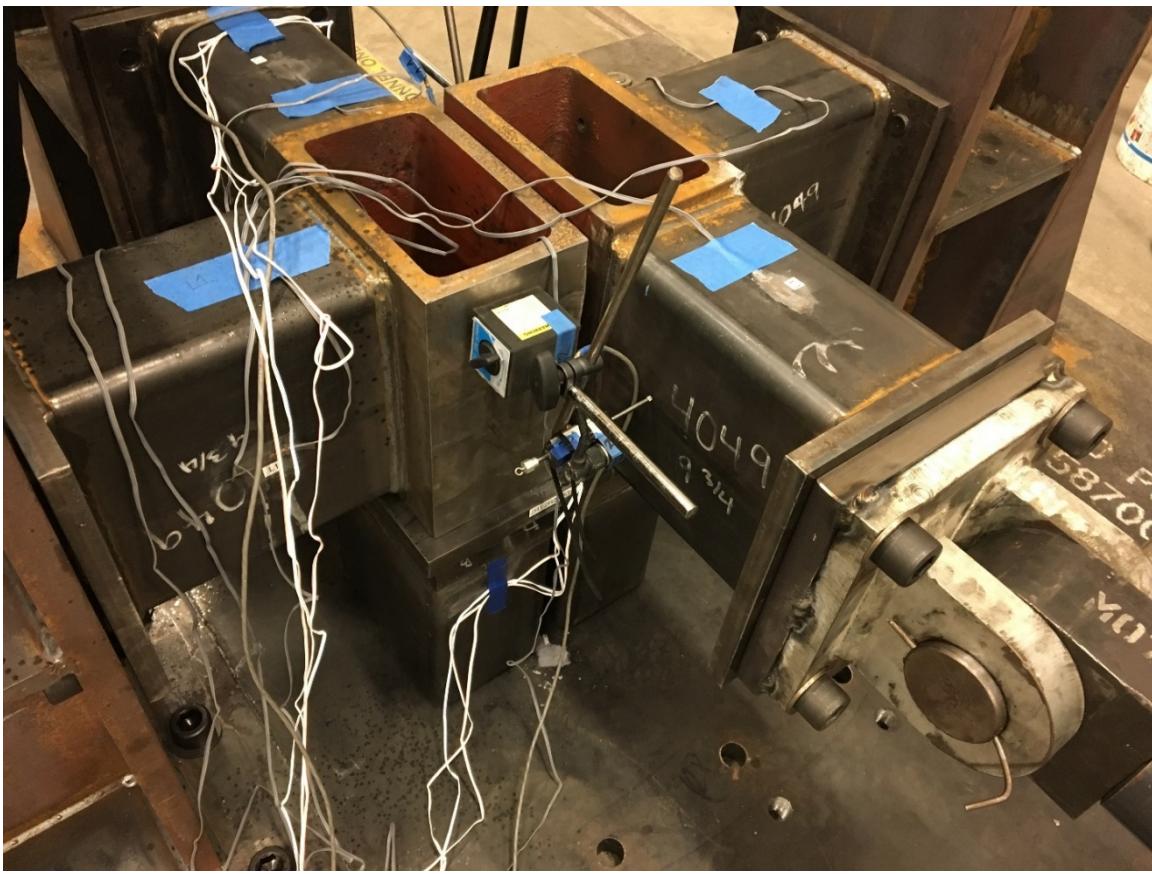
Full-Scale Module-to-Module Connection Shear Force Test Setup
